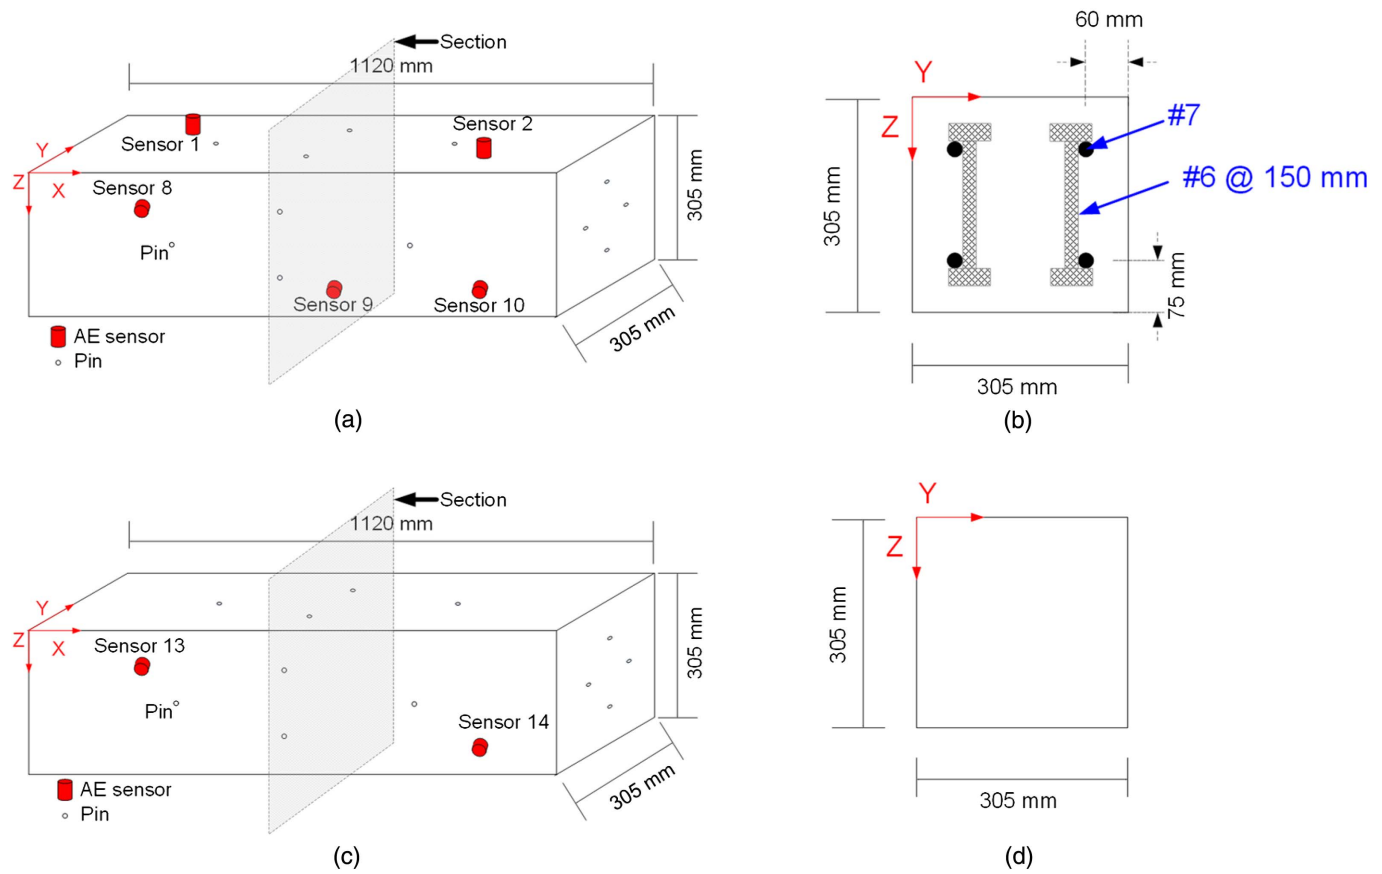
Specimen sensor layouts and structural details: (a) confined and unconfined; (b) section for confined specimen; (c) control specimen; and (d) section for unconfined and control specimens.
